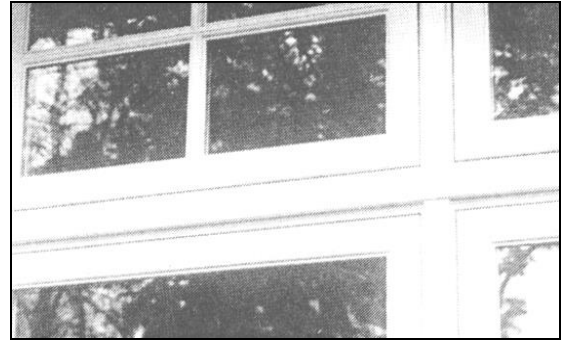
Window Detailing with Balanced Sash and True-Divided Lights
